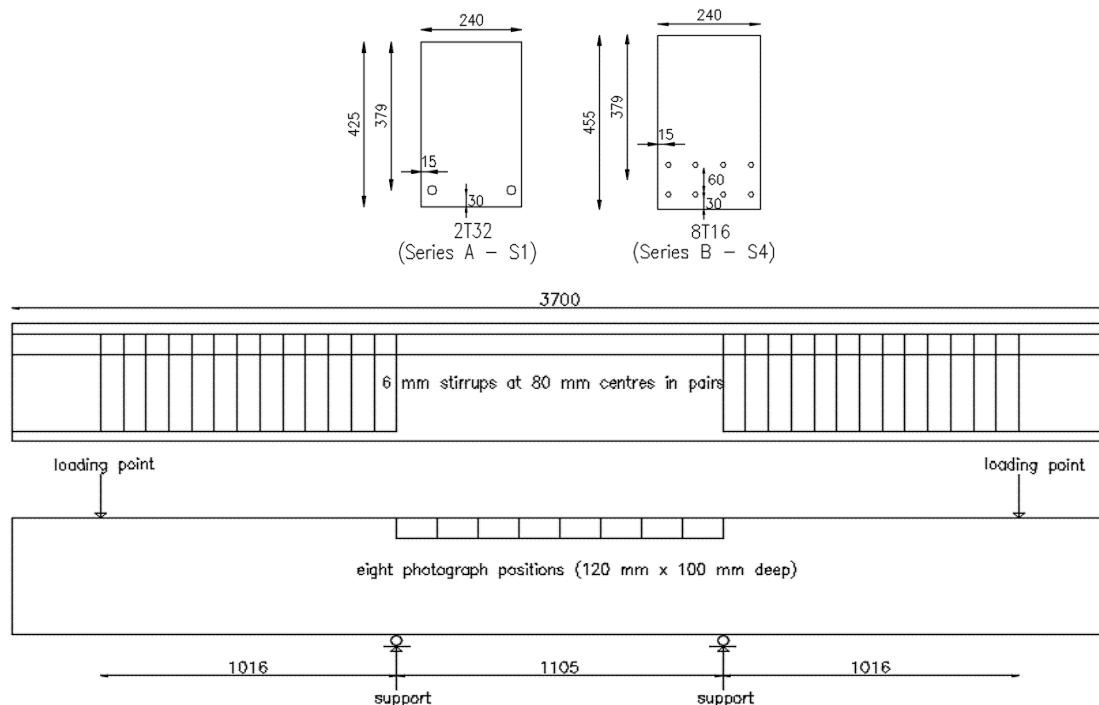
Cross sections and elevation details of beams tested by Makhlof and Malhas [4, 12]
